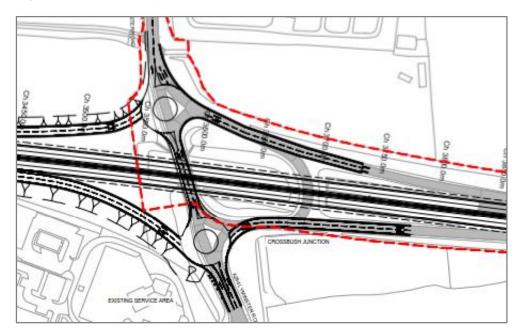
Proposed layout for Crossbush Junction, Option 1
